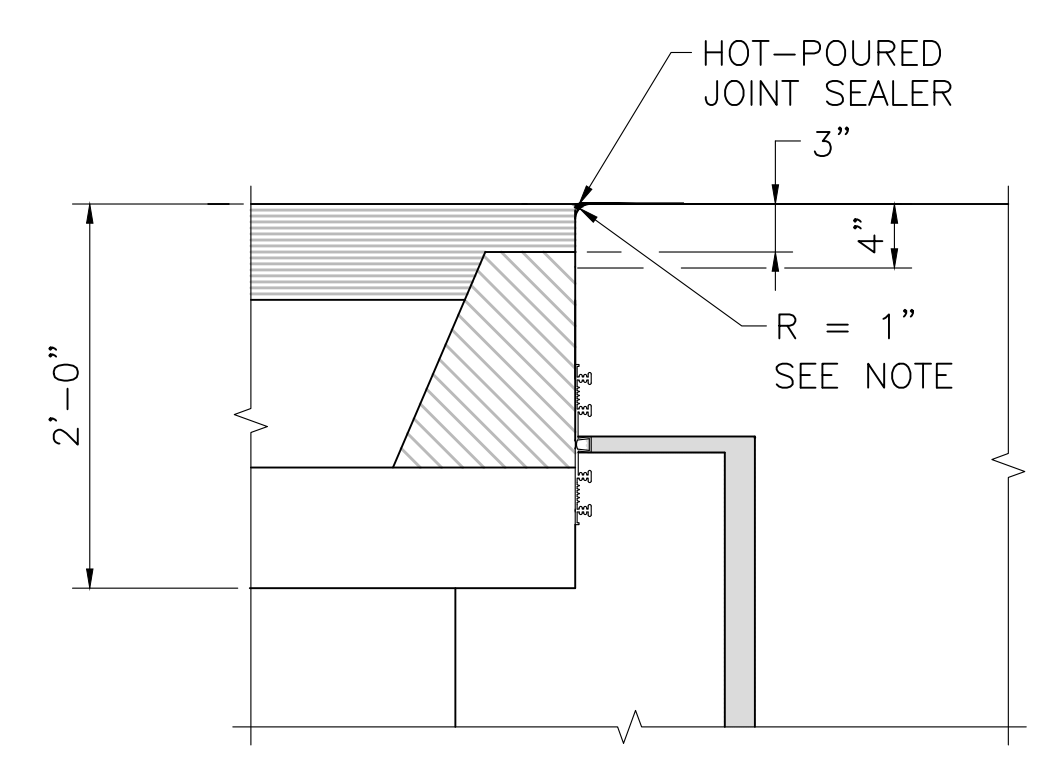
DETAILS AT ABUTMENT - ROADWAY SECTION
